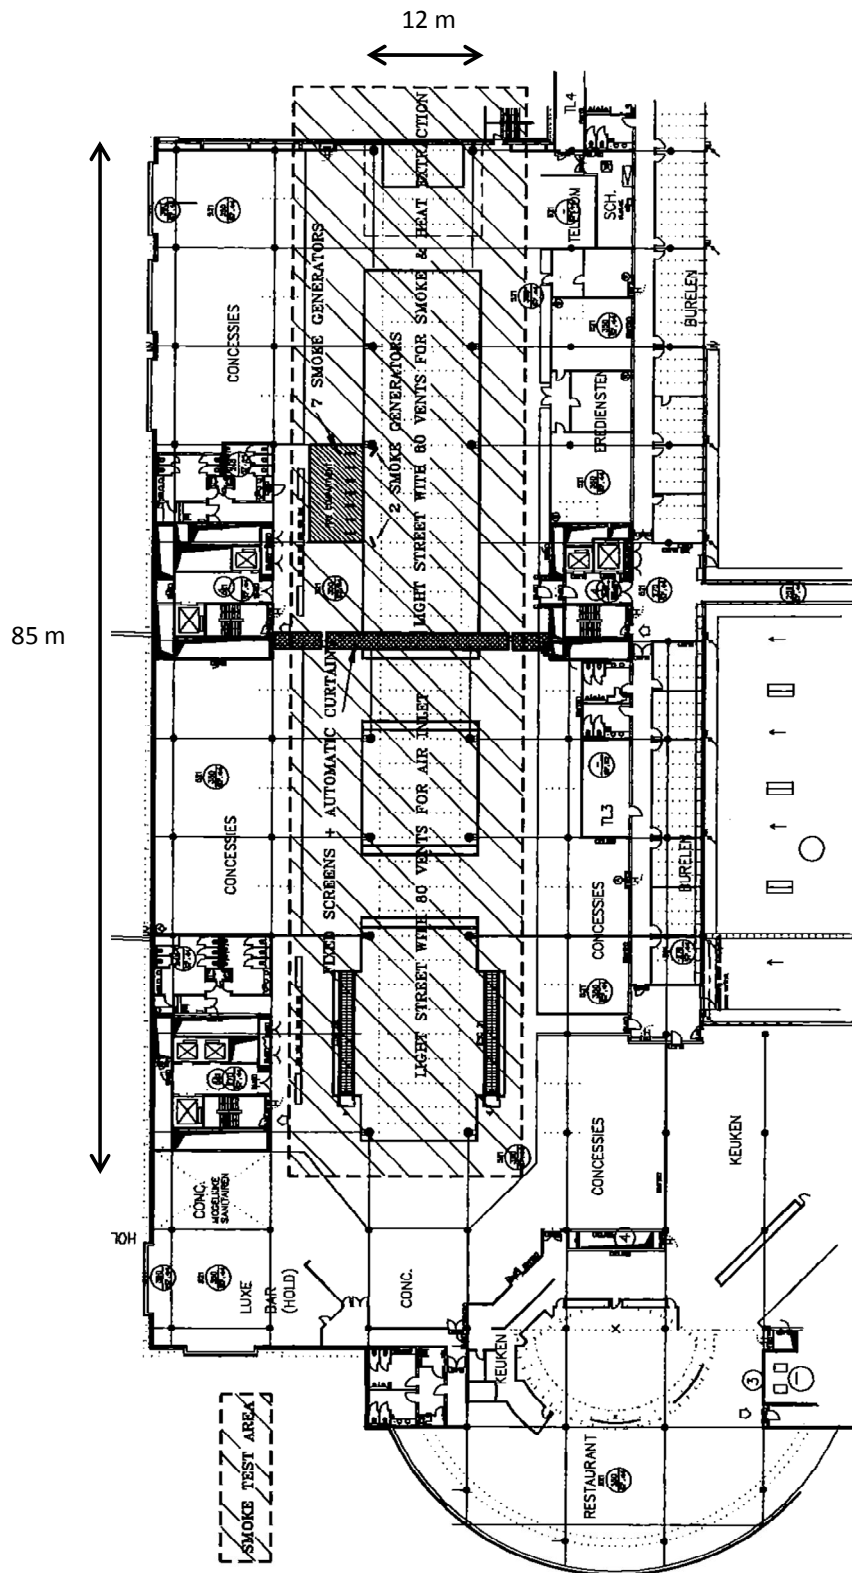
Schematic plan view of the departure level (adapted from [53])
